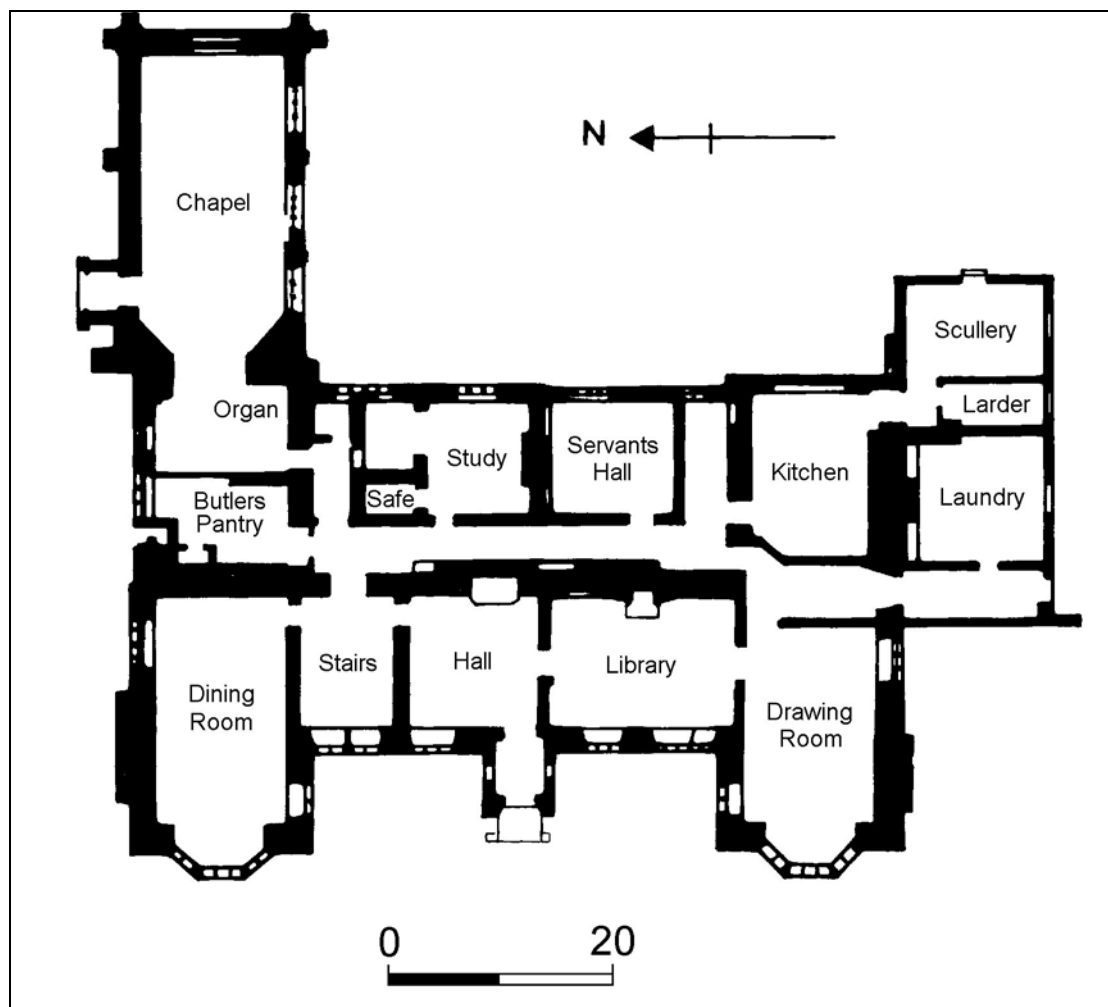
Architects ground floor plan c.1957 with room names (adapted from Beavitt 1995, Fig. 3).
